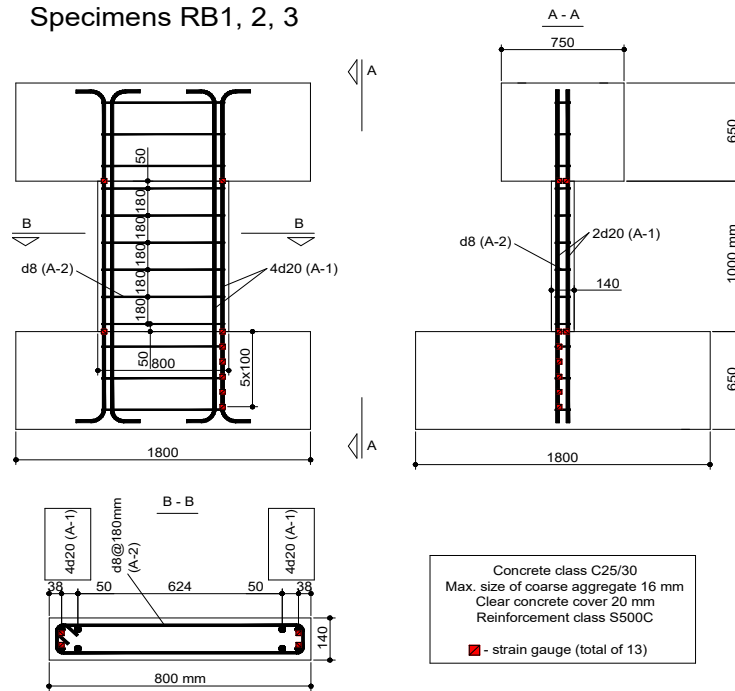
Reinforcement details of specimens RB1, RB2 and RB3
